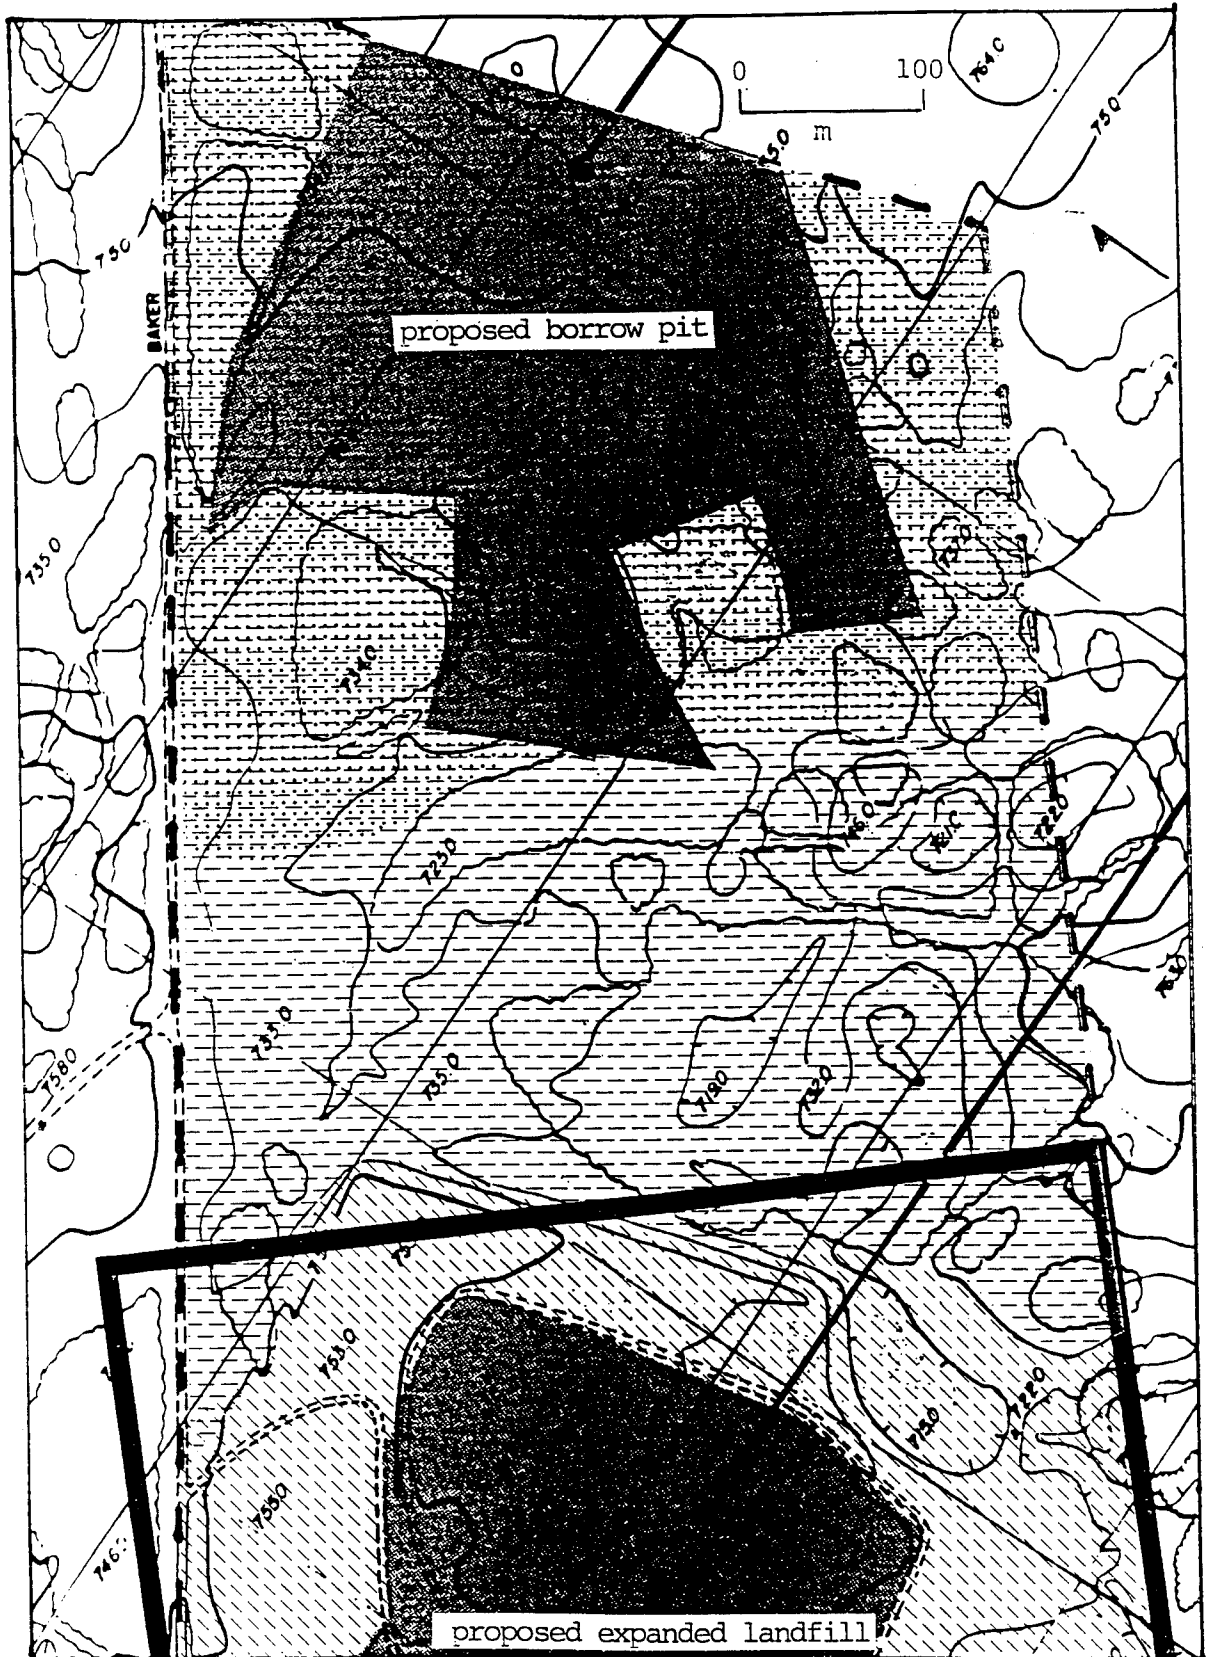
Plan View of Northeast Half of Landfill and Borrow Tract.
